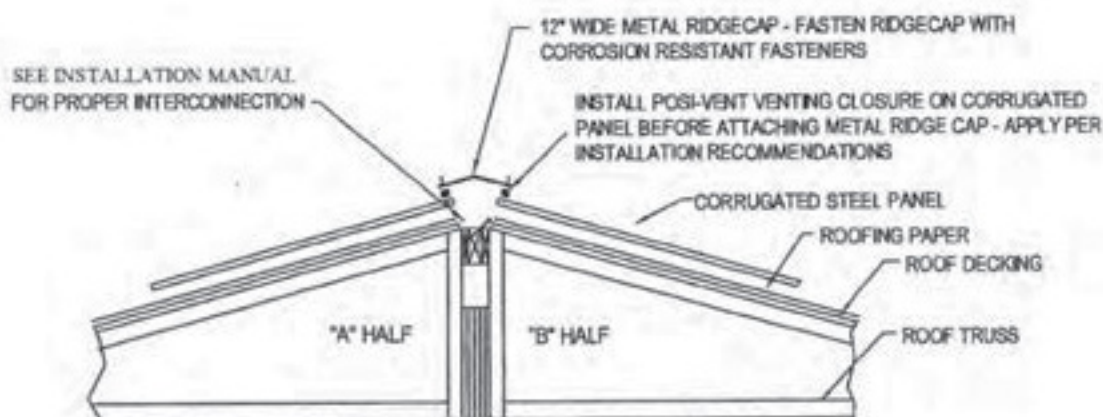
FASTENING DETAIL FOR RIDGE CAP
